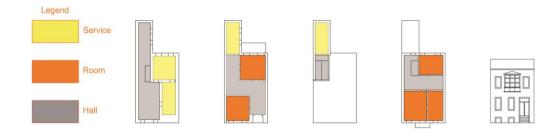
The base sample of the two-story İzmir Houses with plan type 2
